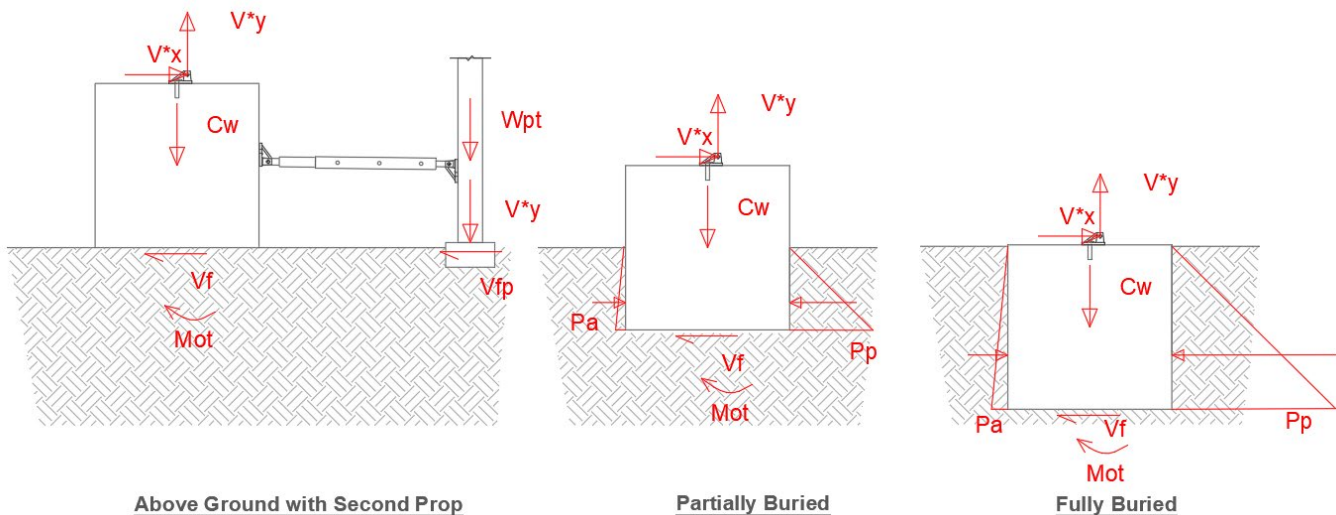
Simplified sliding and uplift actions on concrete ballasts used for panel restraints.
